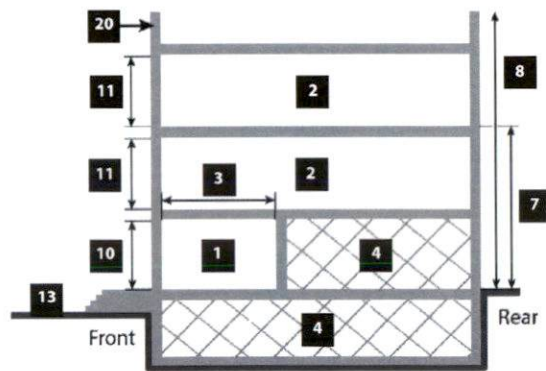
General building height and use diagram shown with basement and rear building interior parking, stoop entry type, and parapet roof type. Not to scale.
